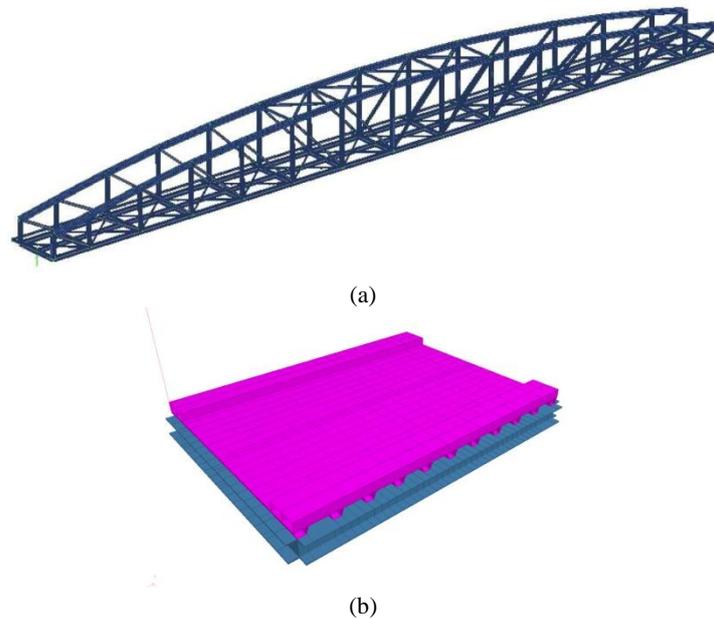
(a) A 3D RM Model of the truss-through structure, and (b) an STAAD model of the metal deck
